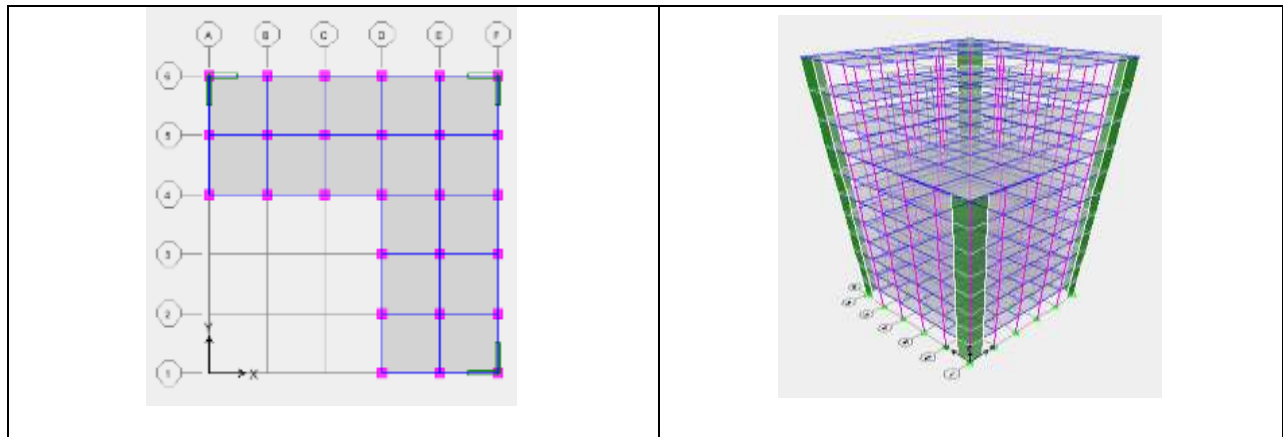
Plan Layout and 3D view of Asymmetric building Model-5
